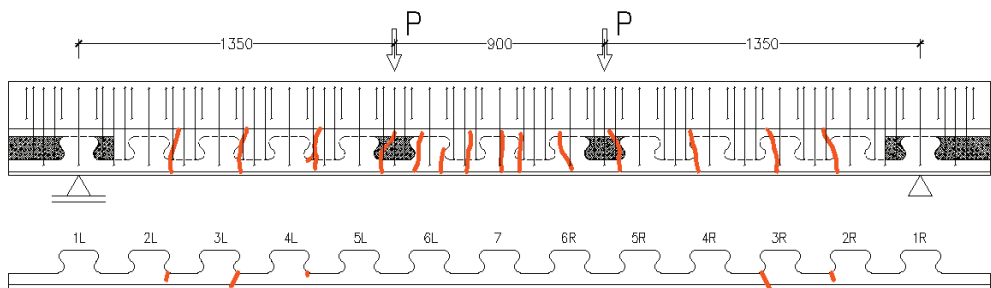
Cracks on concrete slab (upper part of picture) and on steel section (down)
